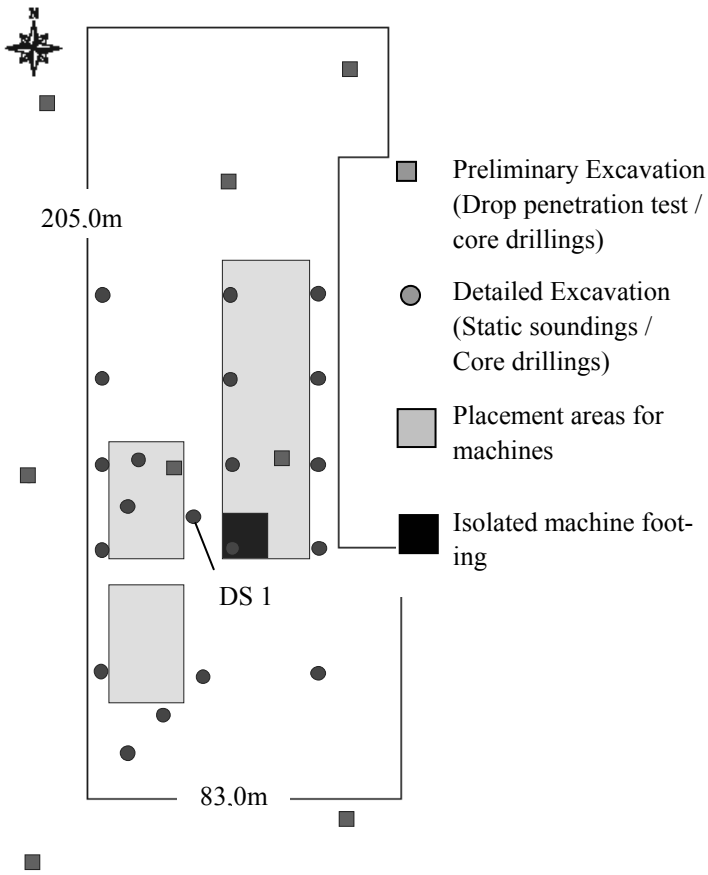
Arrangement of preliminary and detailed excavation/ Placement of the foundations
